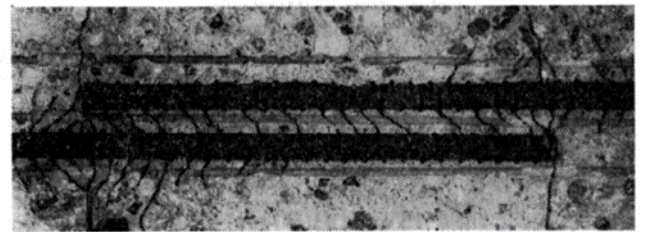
Internal cracks in concrete around lap joints of bar¹⁾
